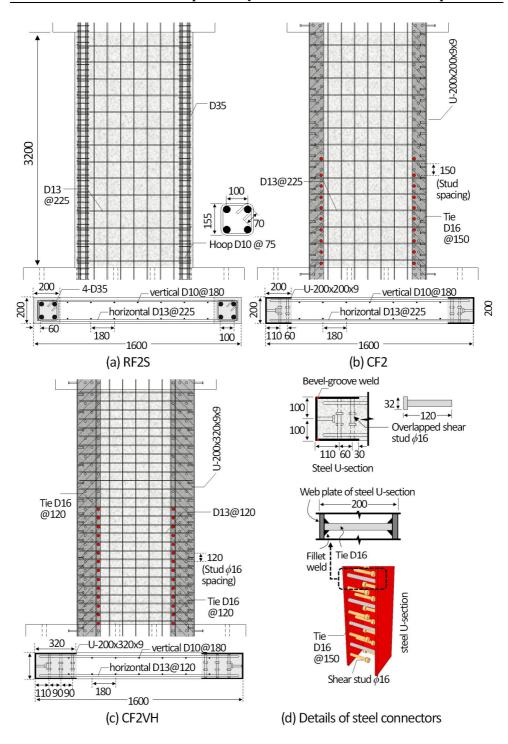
Details of flexural yielding specimens: (a) RF2; (b) CF2; (c) CF2VH; and (d) details of steel connectors.
